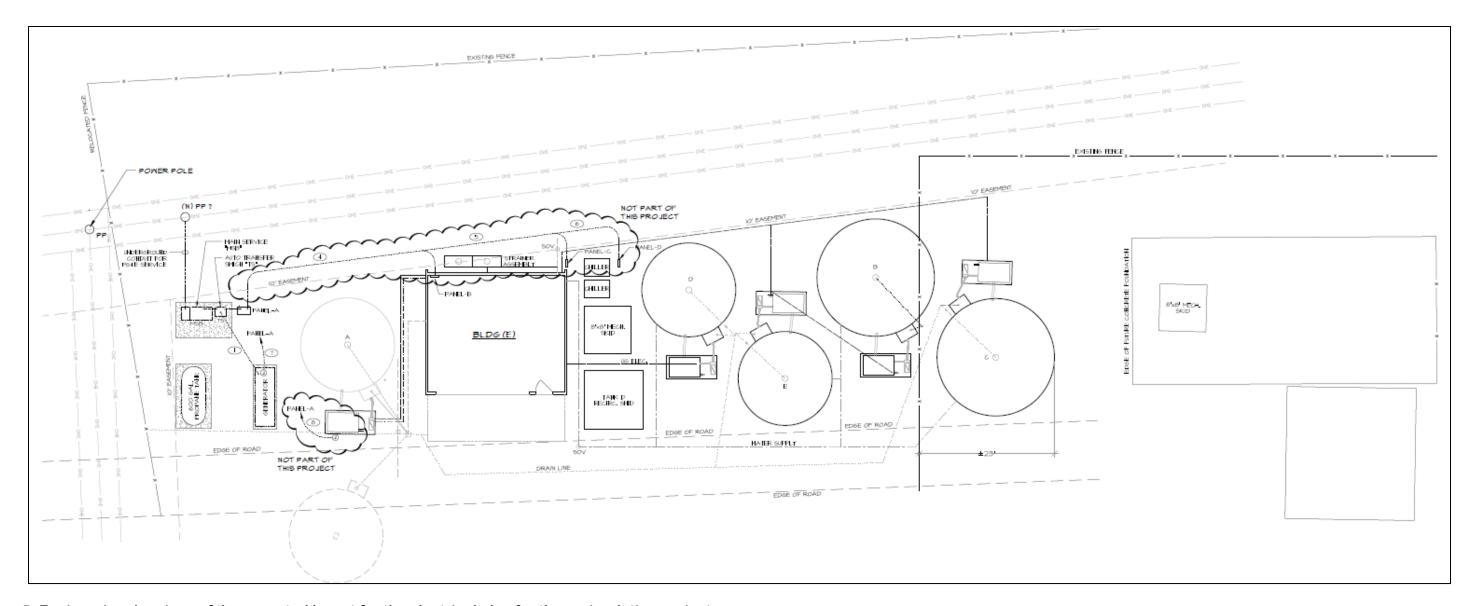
Engineering drawings of the expected layout for the electrical plan for the recirculation project.
